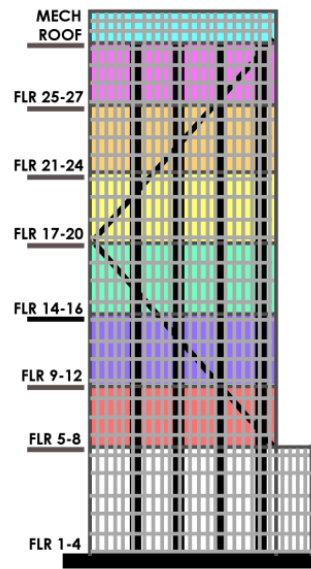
Construction sequences were divided by series of floors. Above, the floor division is presented and distinguished by color.
